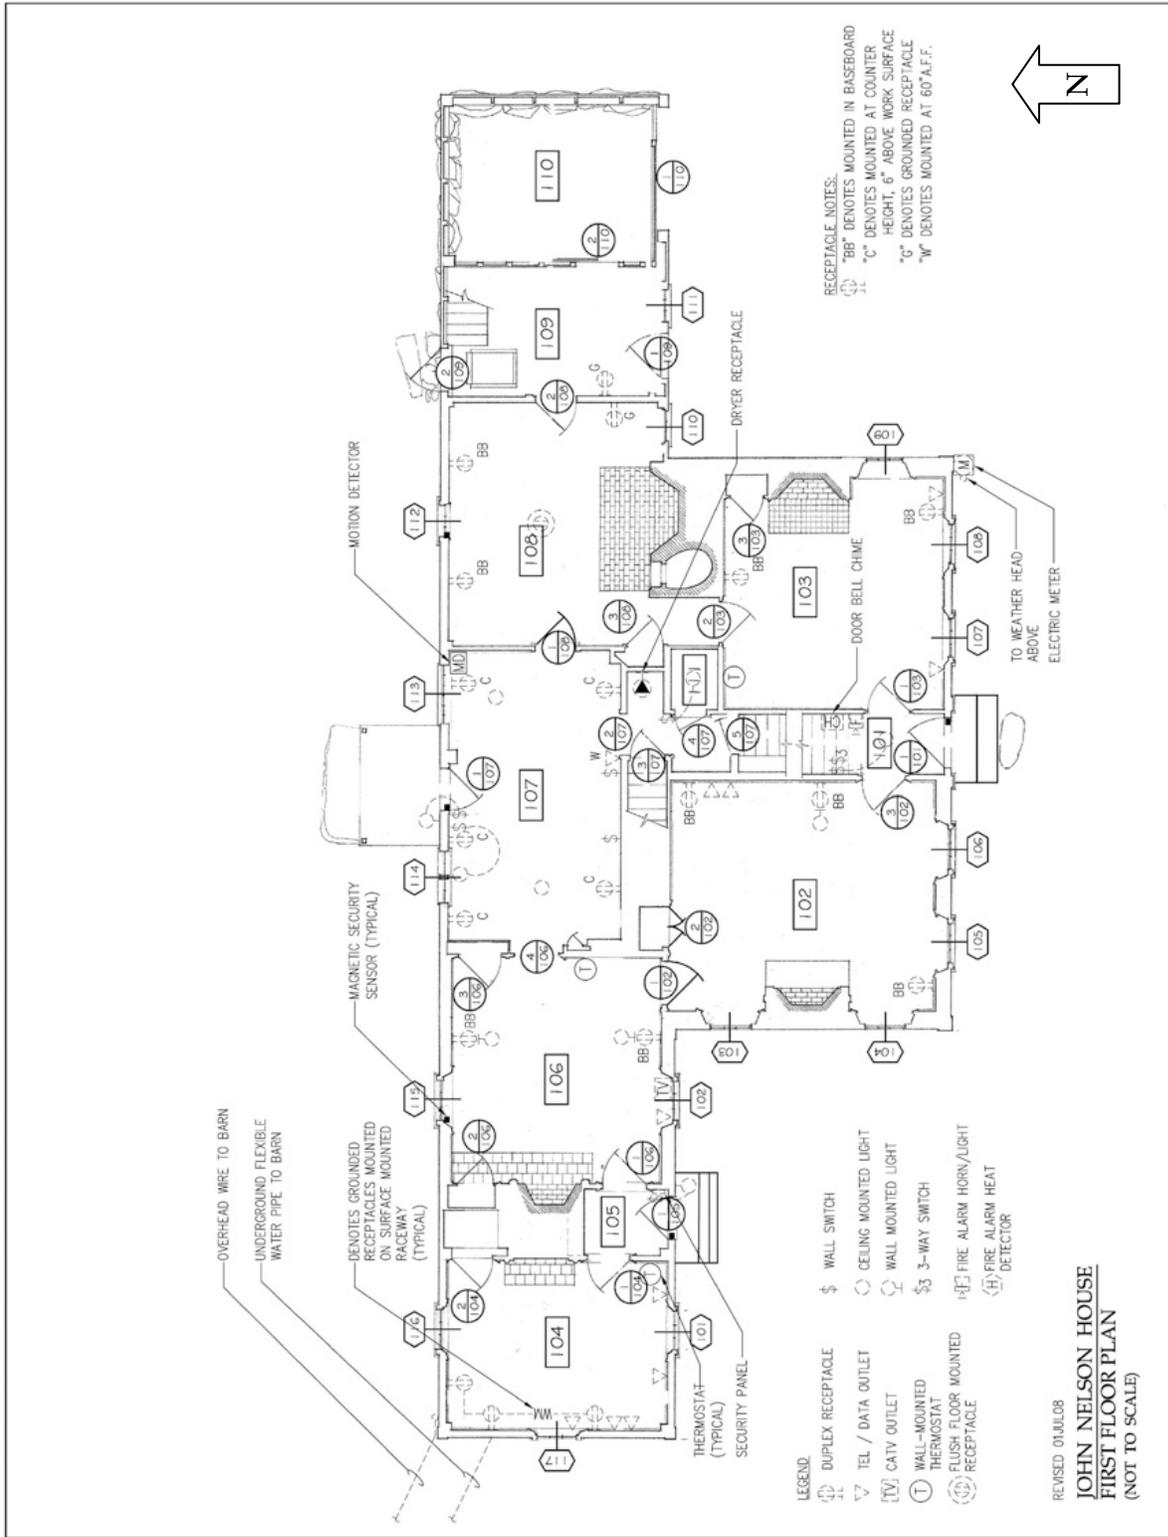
John Nelson House, first floor plan with room, doorway, window, and utilities key.
